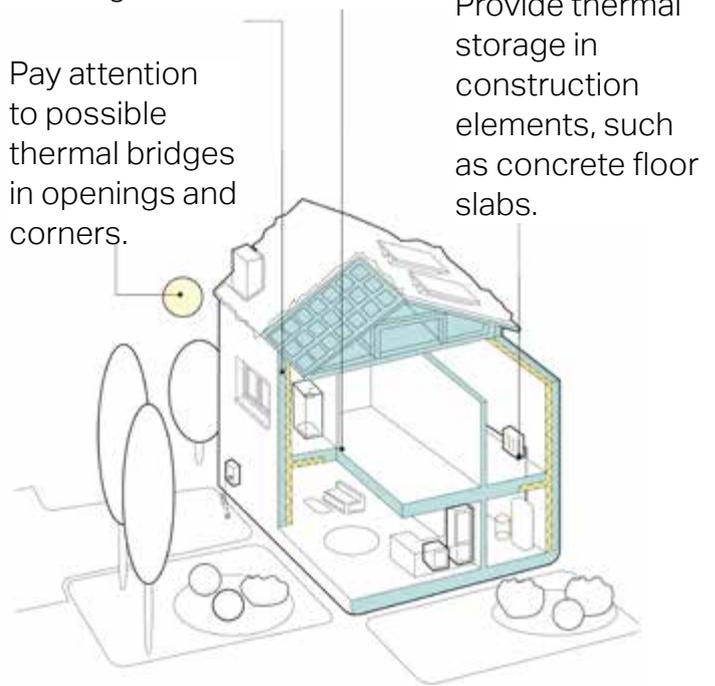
Diagram showing areas of concern regarding building solutions for thermal mass, insulation and air tightness.
